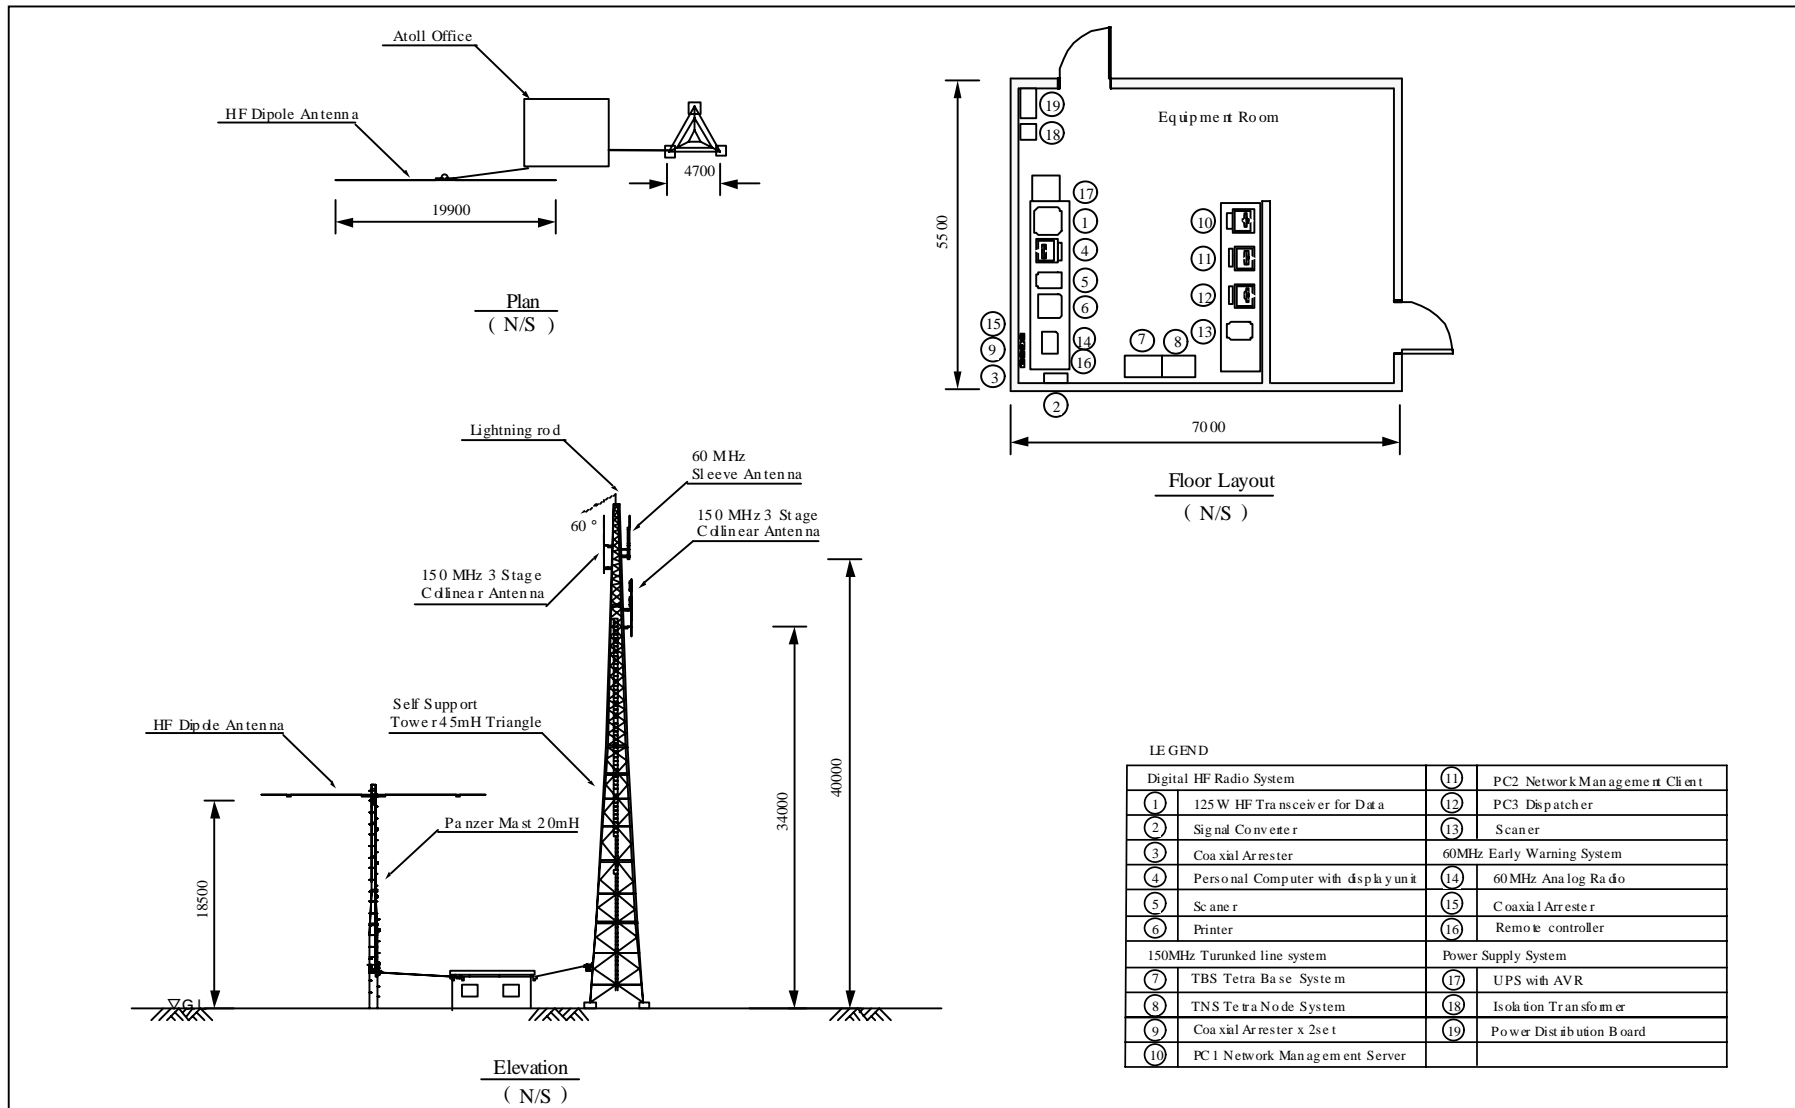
6 Example of Typical Facility Layout (Atoll Office)
